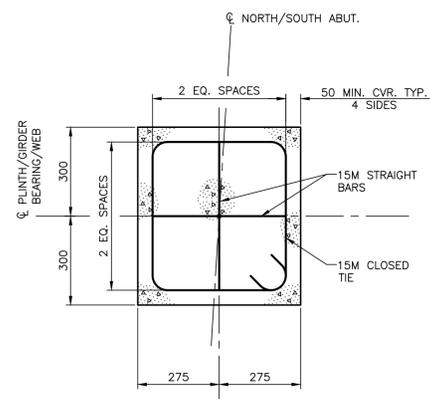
DETAIL - BEARING LAYOUT PLAN AND ELEVATIONS
